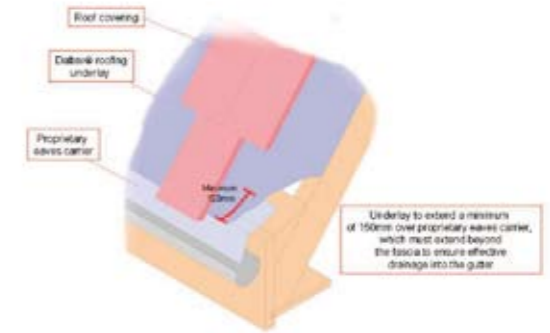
Daltex® Roofing Underlay: Eaves Detail
